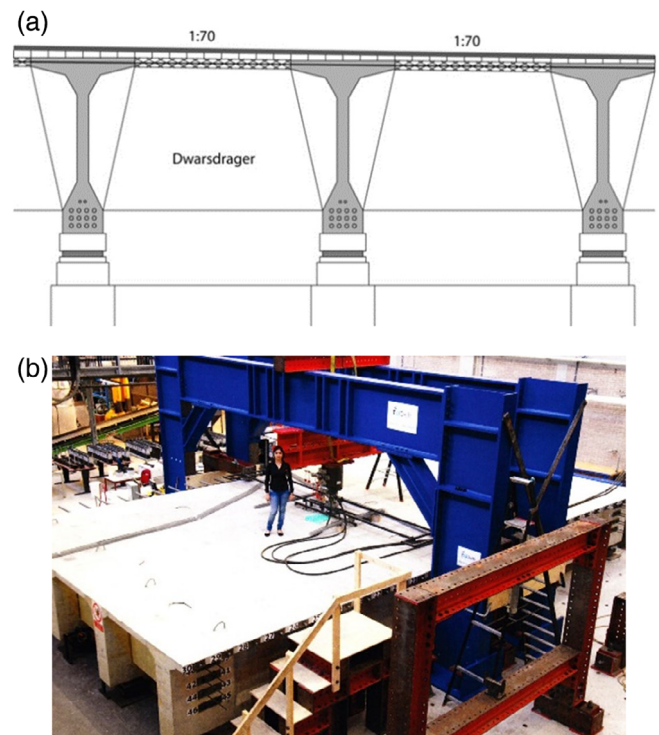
(a) Cross section of the bridge deck. (b) Punching shear test on the bridge deck (scale 1:2) (Amir et al.⁵⁻⁷).
